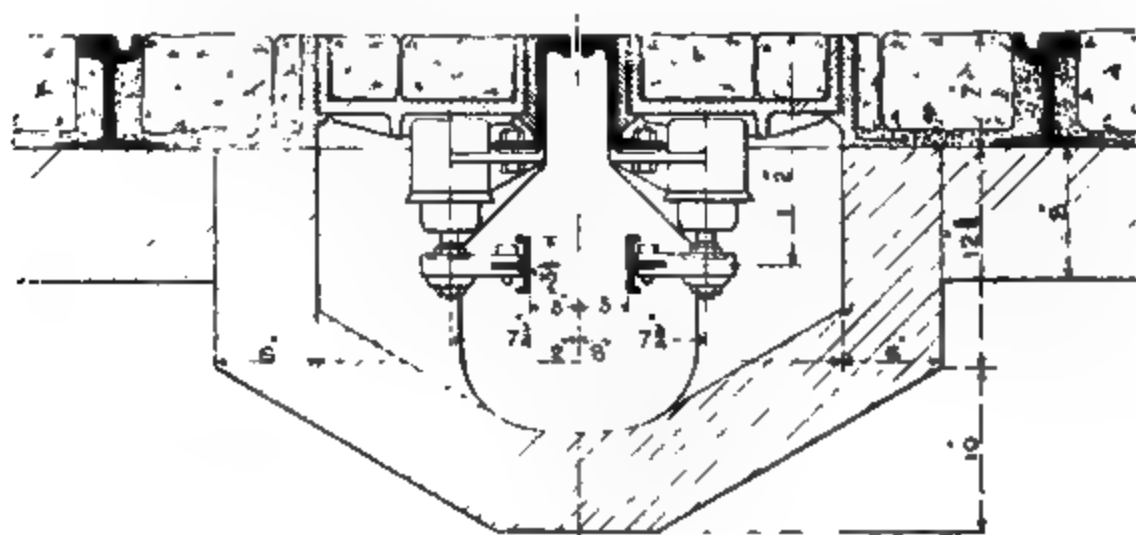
L.C.C. Conduit Tramways (1903 construction). Cross-section of Track at Insulator Pocket.
